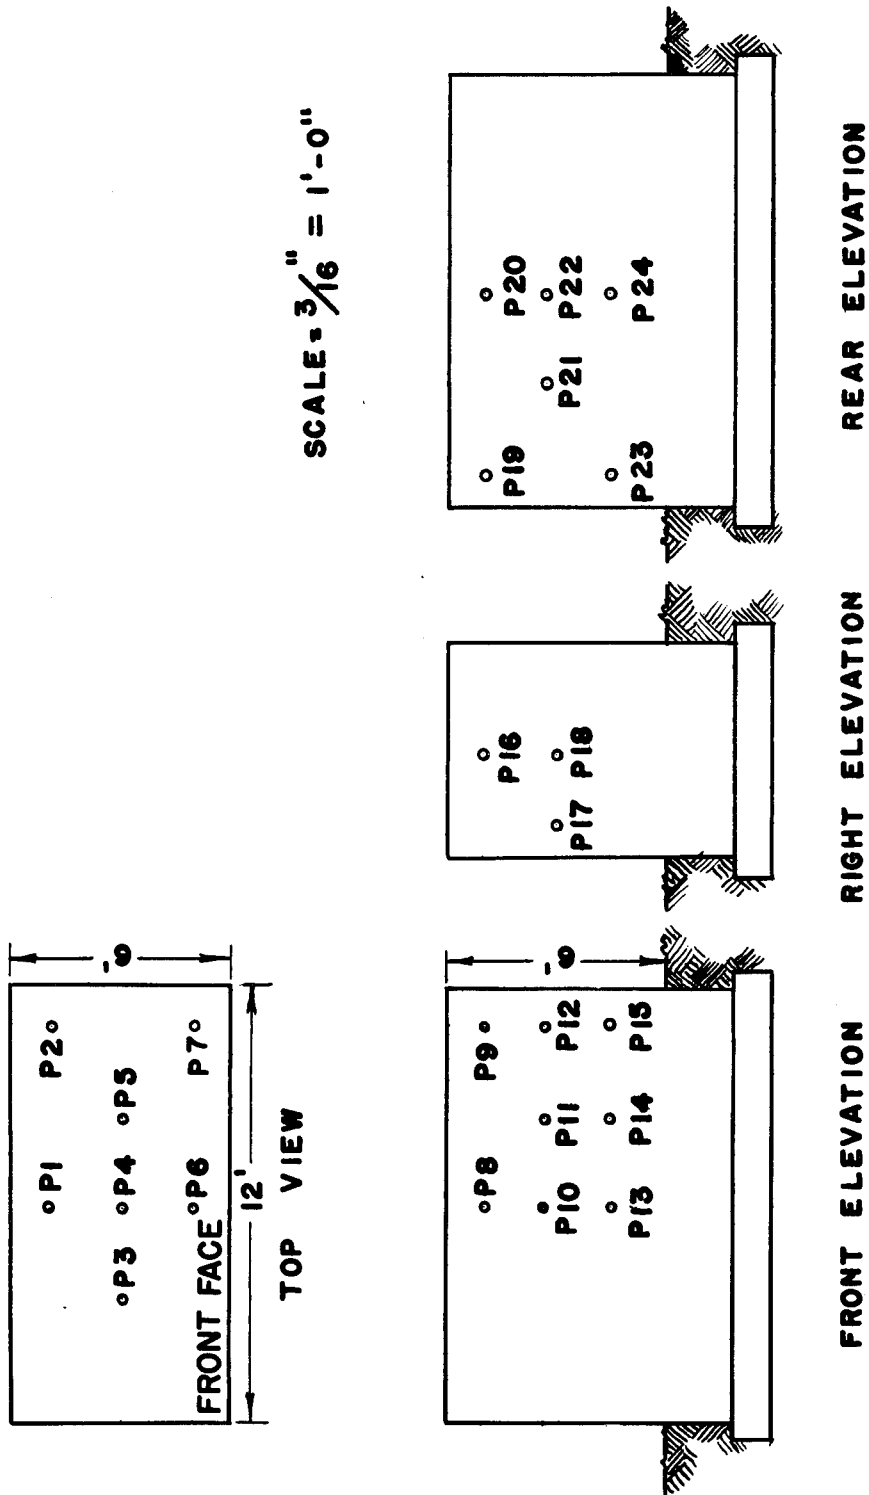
Gage Layout for 3.1s and 3.1t Structures
